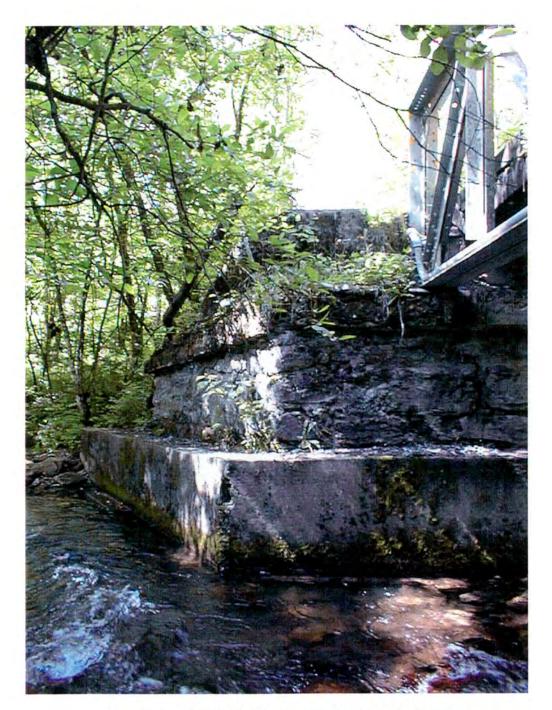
Bridge No. 1 stone abutment showing concrete support wall addition. View SW
